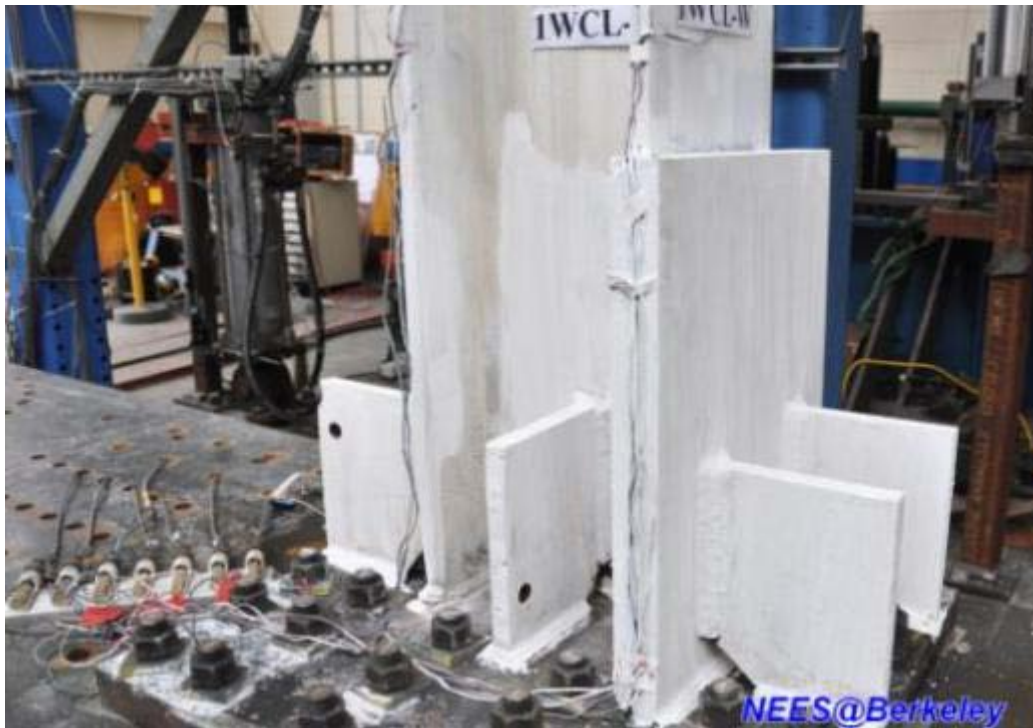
The west side column base of TCBF-B-2 specimen after repair with 1-in. thick stiffener plates and a 2-in. thick flange cover plate
